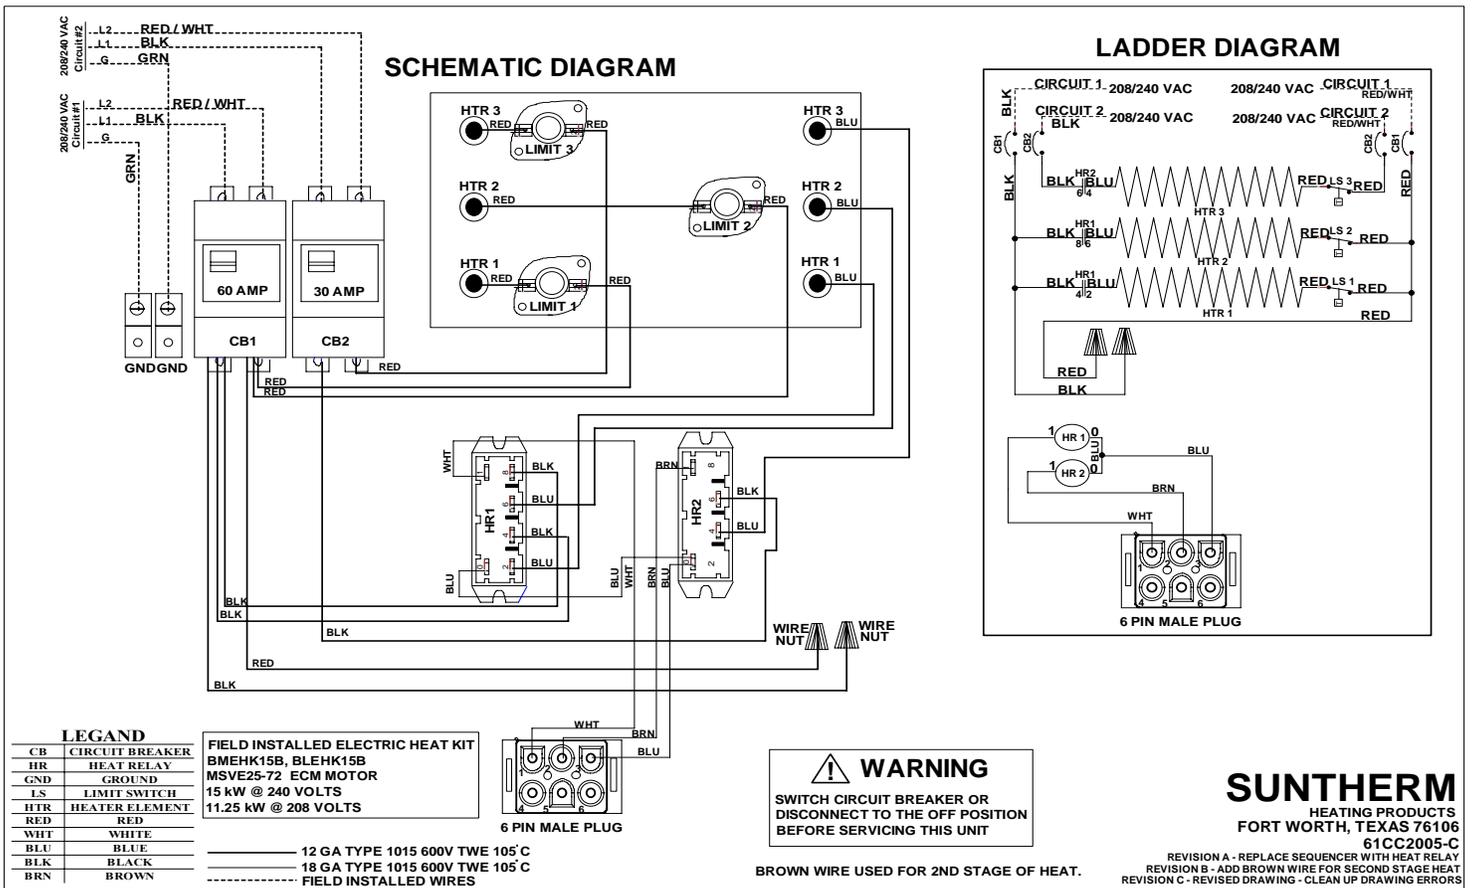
MMVE 37-72 - ECM 2.3 - 15 kW Field Installed Heater Kit
